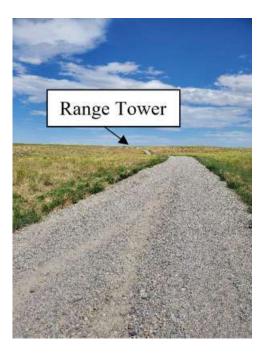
Picture of Road Segment between Range Tower and Range Building (Tab S-24)
